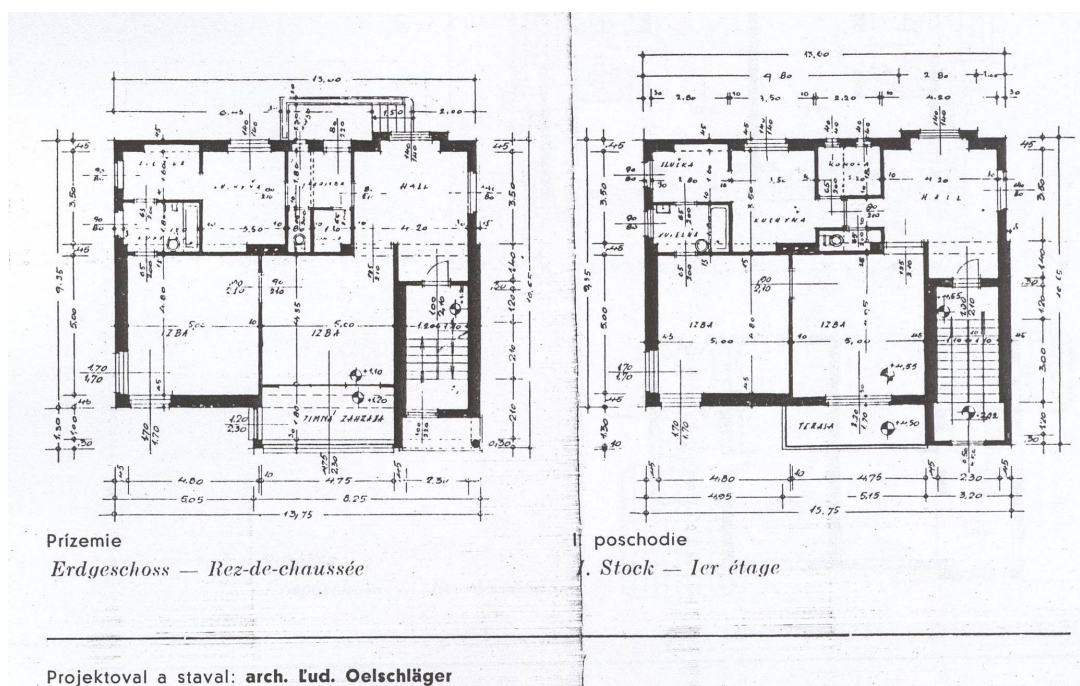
Floor plans of the villa. Source: Slovenský staviteľ (The Slovak Builder, year 6, 1936, p.72)
